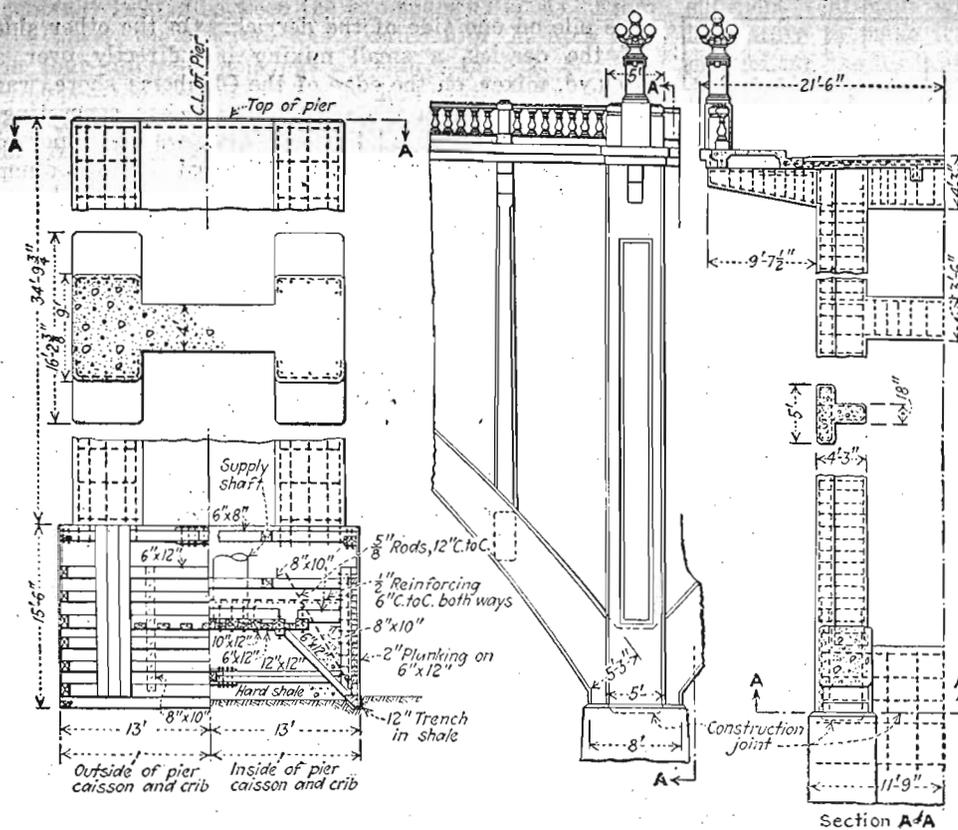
TYPICAL PIER AND CAISSON DETAILS
